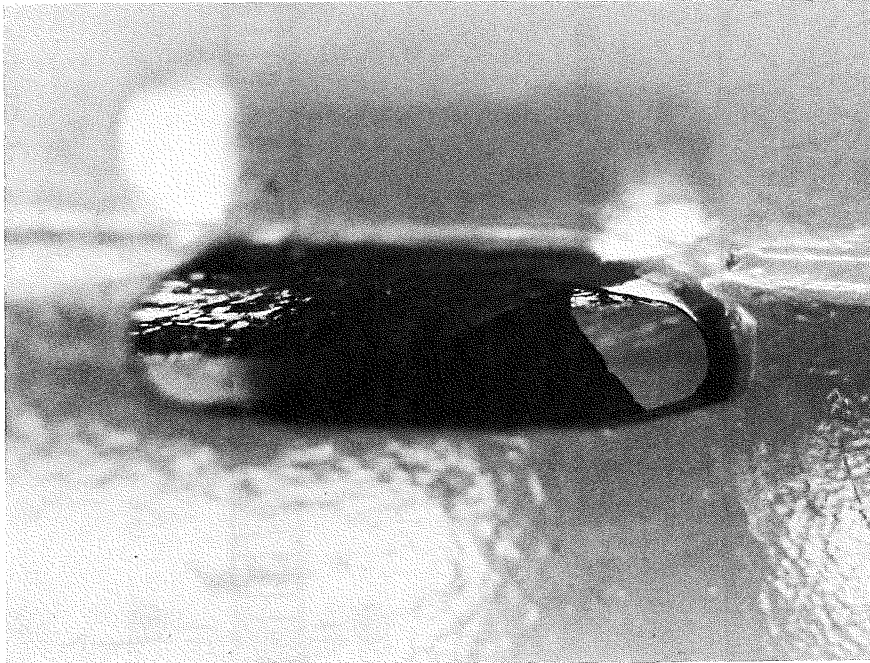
Web Slot below Top Flange Electroslag Weld
